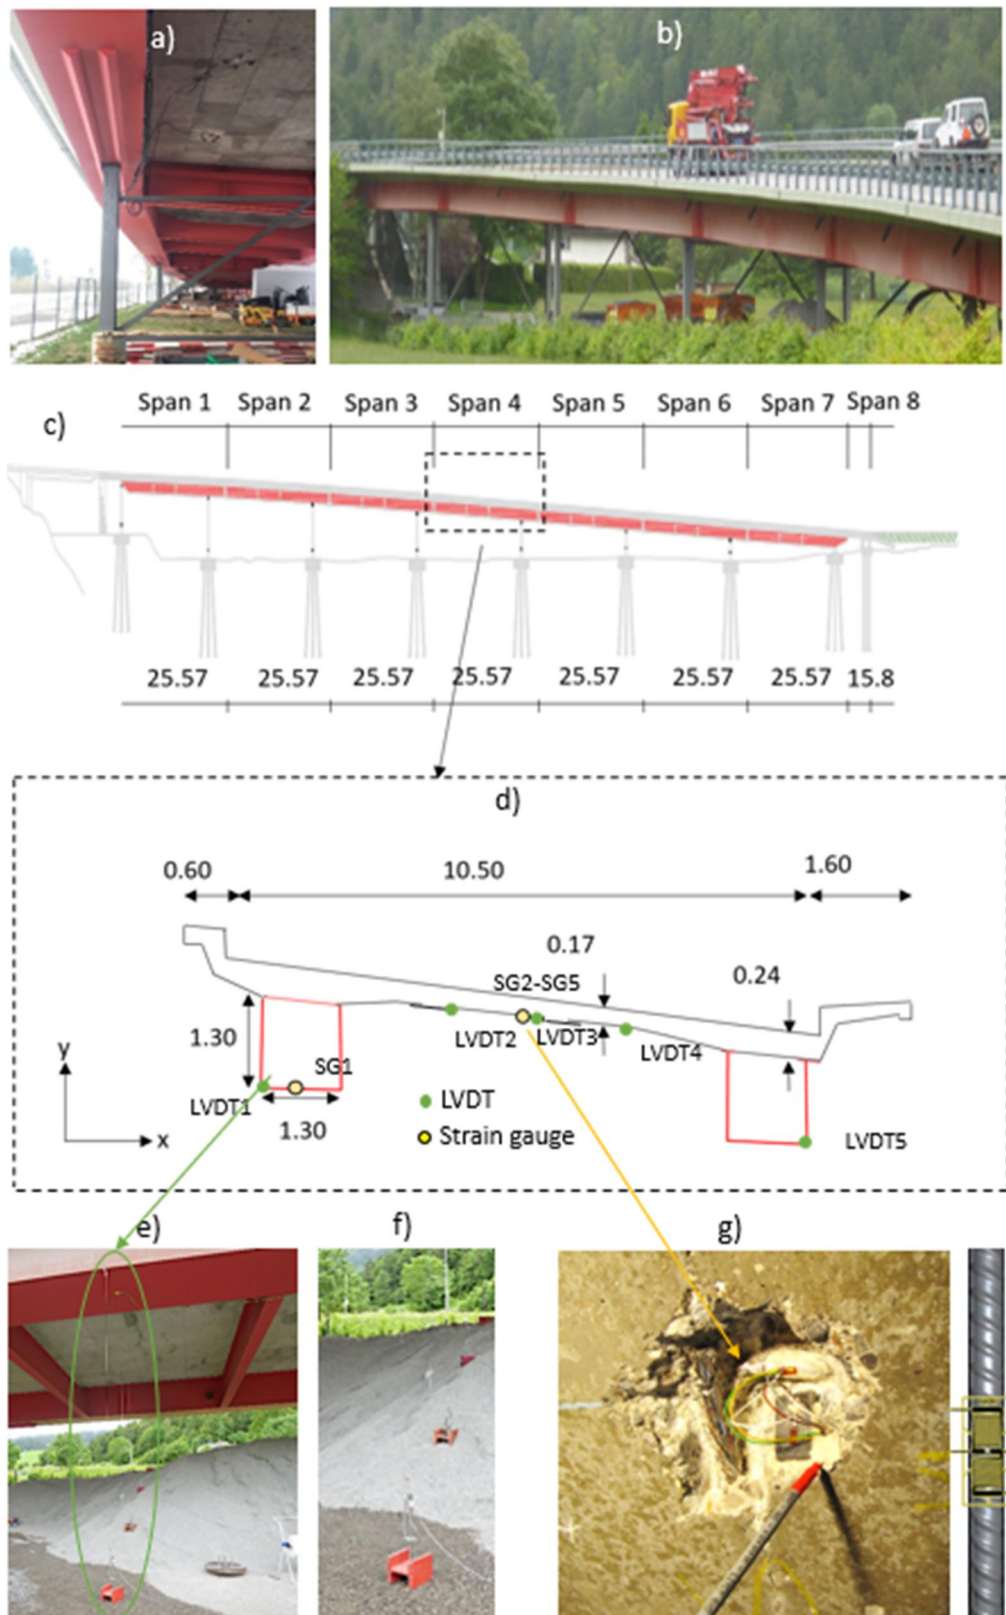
Bridge presentation. a; b) Bridge photographs; c) evaluation of the bridge; d) monitoring installed on the fourth span of the bridge; e,f) LVDT measurements; g) strain gauge glued on the longitudinal rebar at midspan.
